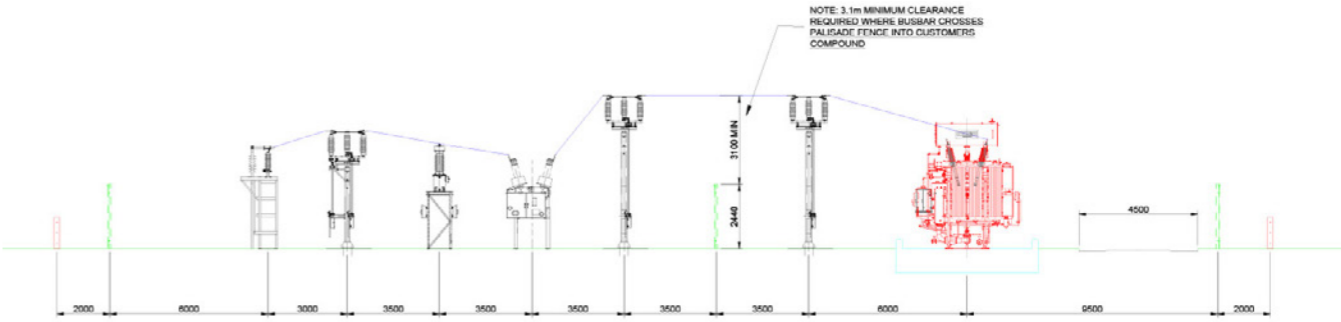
DNO SUBSTATION & CONTROL ROOM ELEVATION
